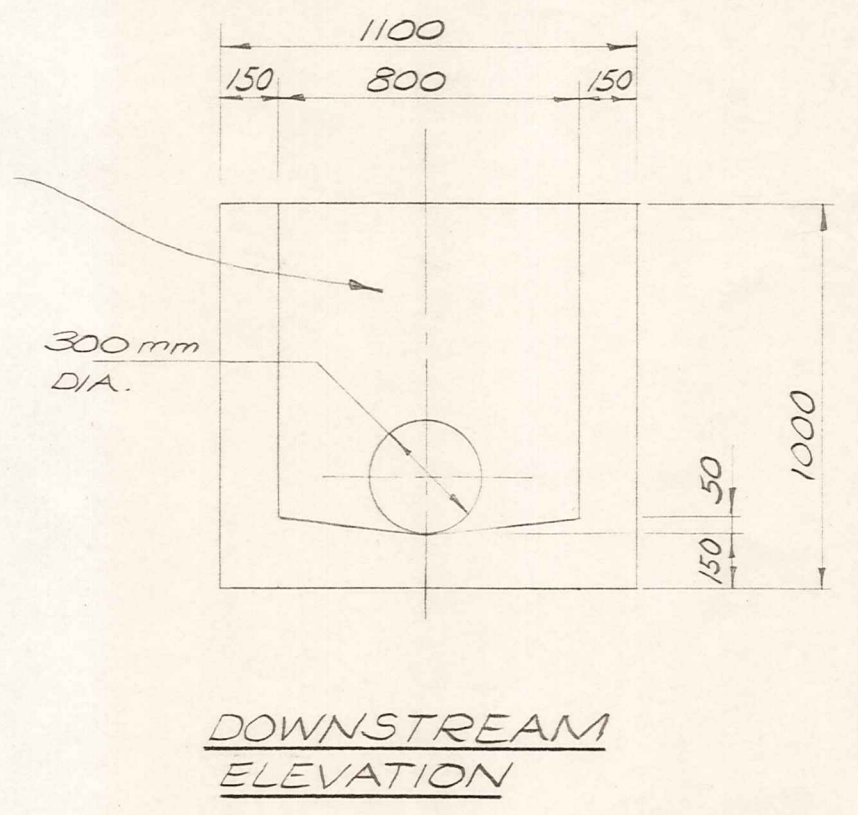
DETAILS OF COMBINATION MANHOLE AA3/M1 Scale 1:50
